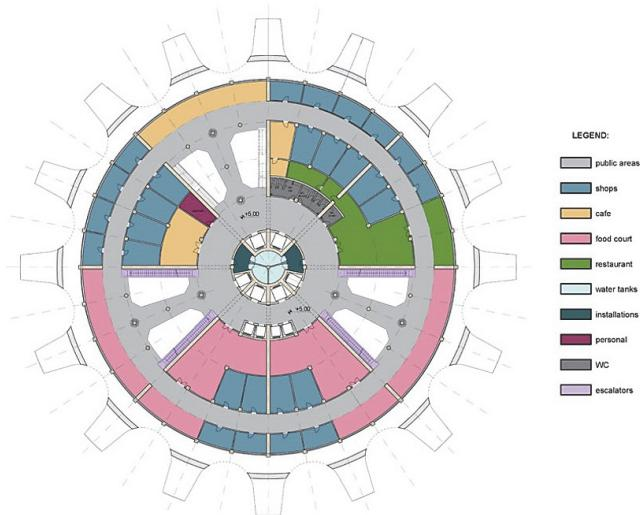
Architectural plan of the second floor (level 34.50 m) (Aleksandrov et al., 2014b)
